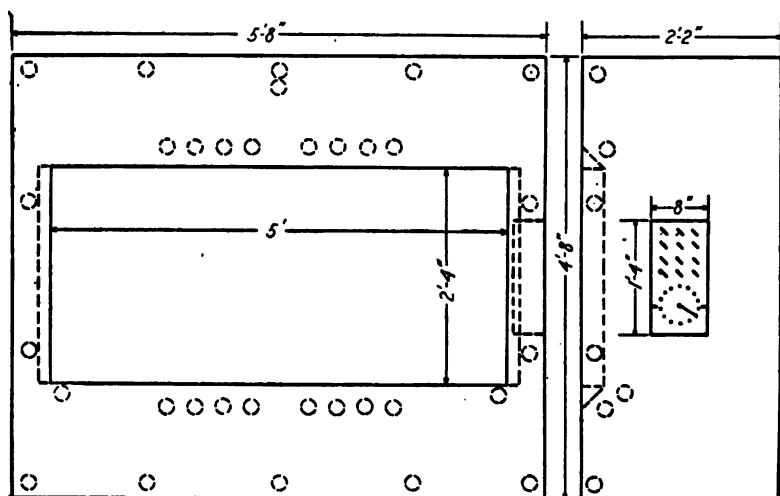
Showing dimensions and locations of lamps in the demonstration booth.
